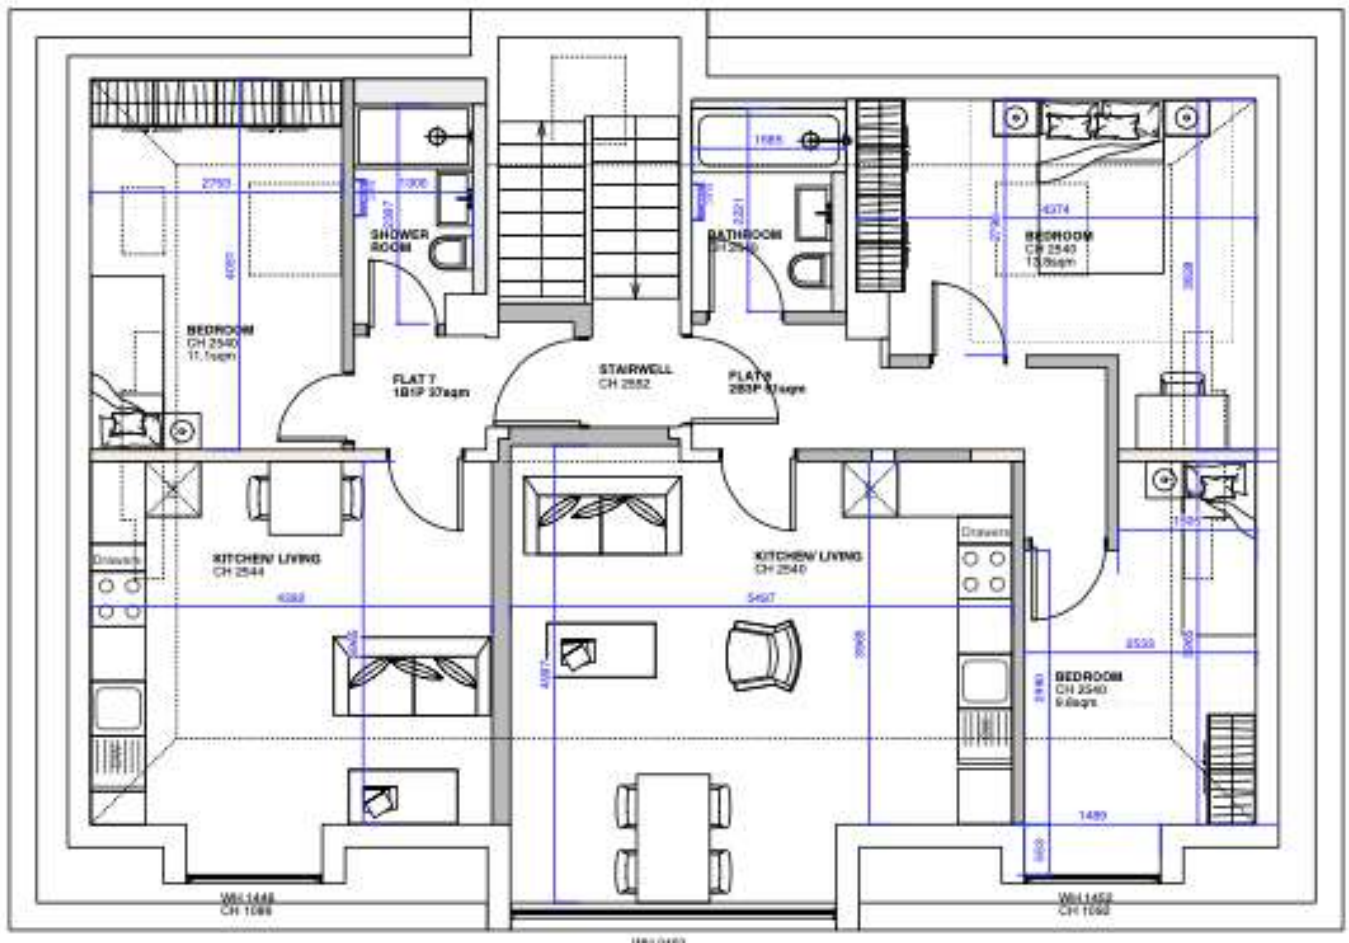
Architectural Drawings of Proposed Second Floor
